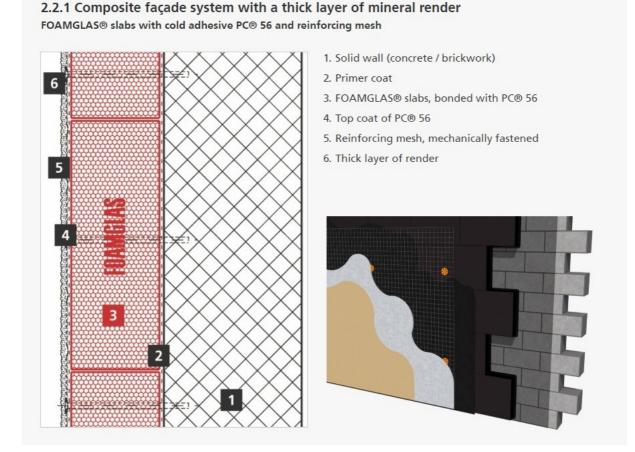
Foamglas® wall insulation system (source: Foamglas)
